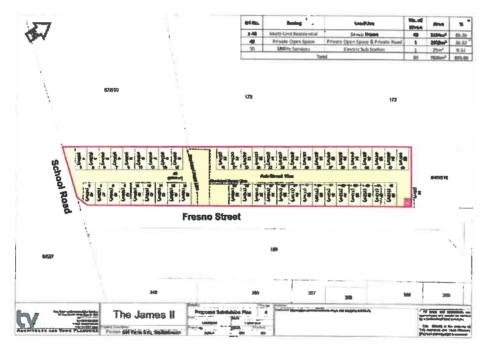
INITIAL SUBDIVISIONAL PLAN
